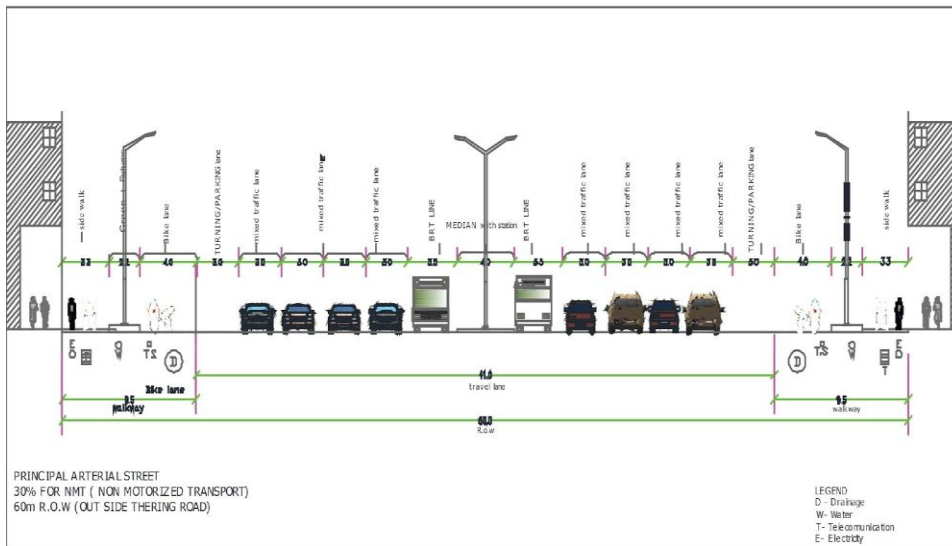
Street section (b) of Principal Arterial Road outside the inner ring road
